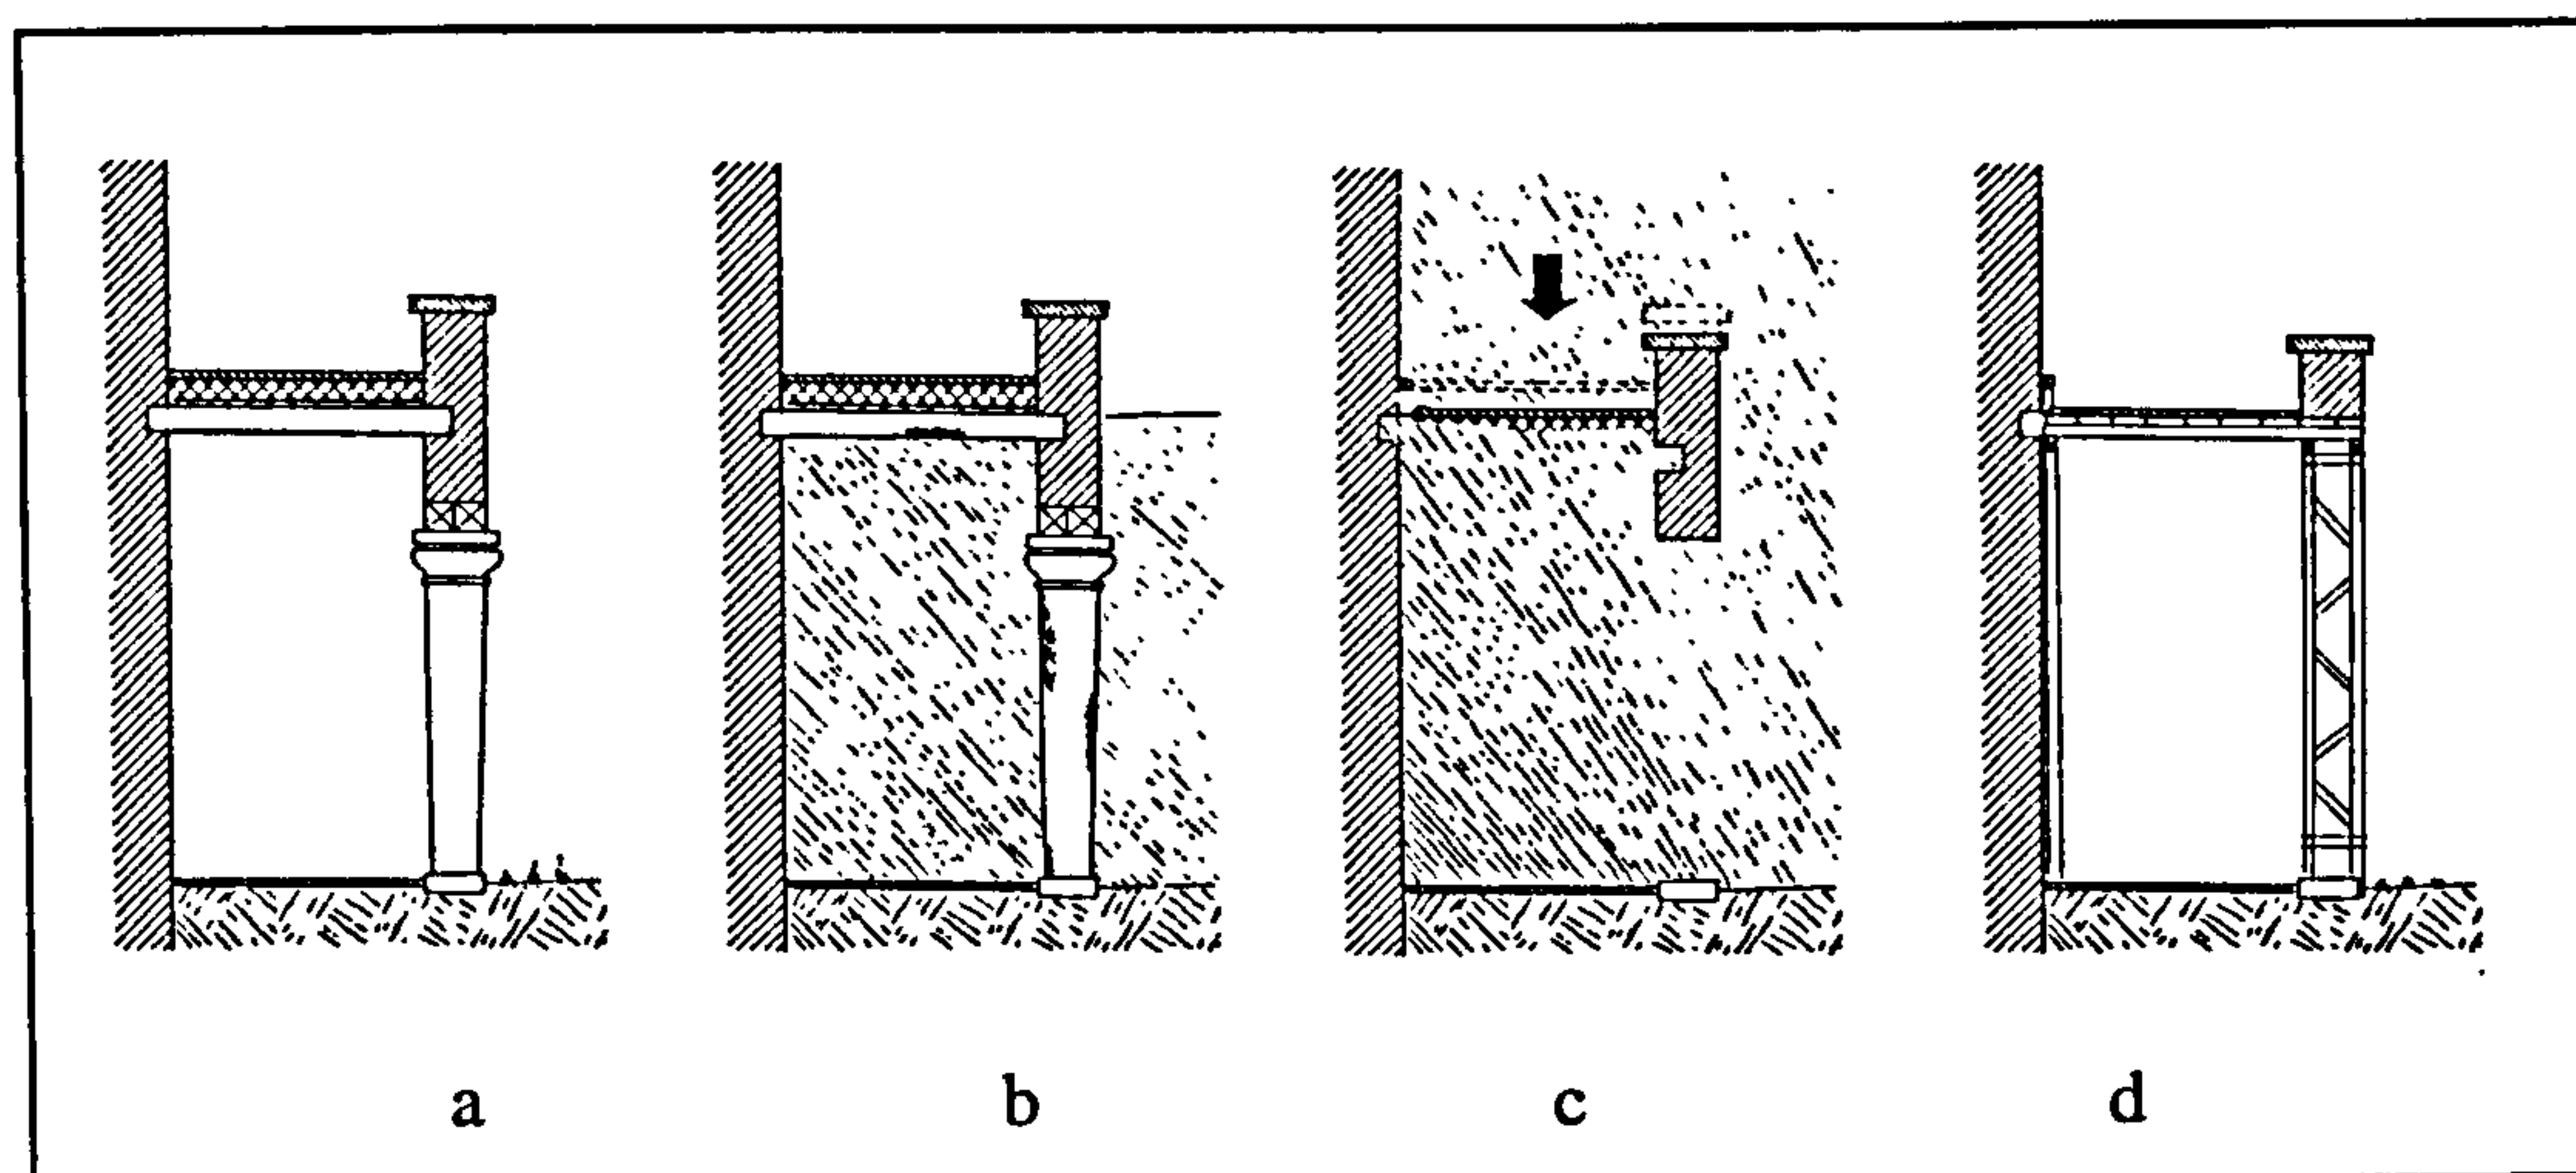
Schematic section through the East-West Corridor. The original construction (a), after the deliberate infill (b), after the beams rotted and the floor sunk (c), and Fyfe's reconstruction as found but at the wrong height (d).
